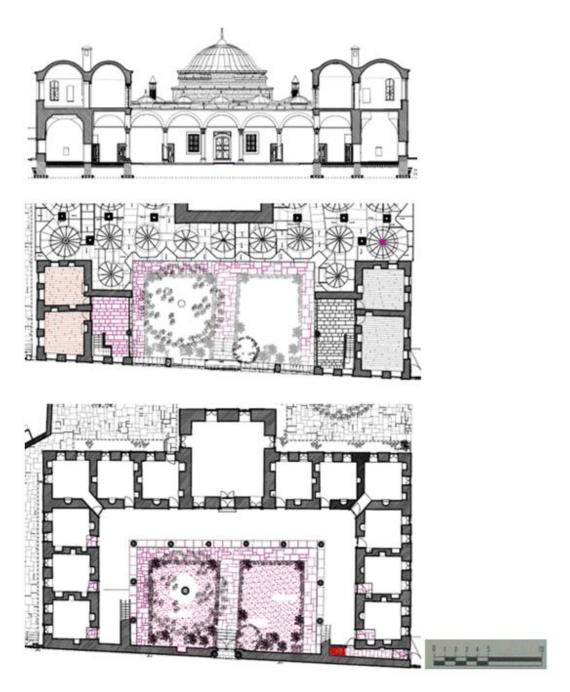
Upper Floor Plan, Ground Floor Plan and Section of applied restoration project, 2012 (ArtLite Architecture)
